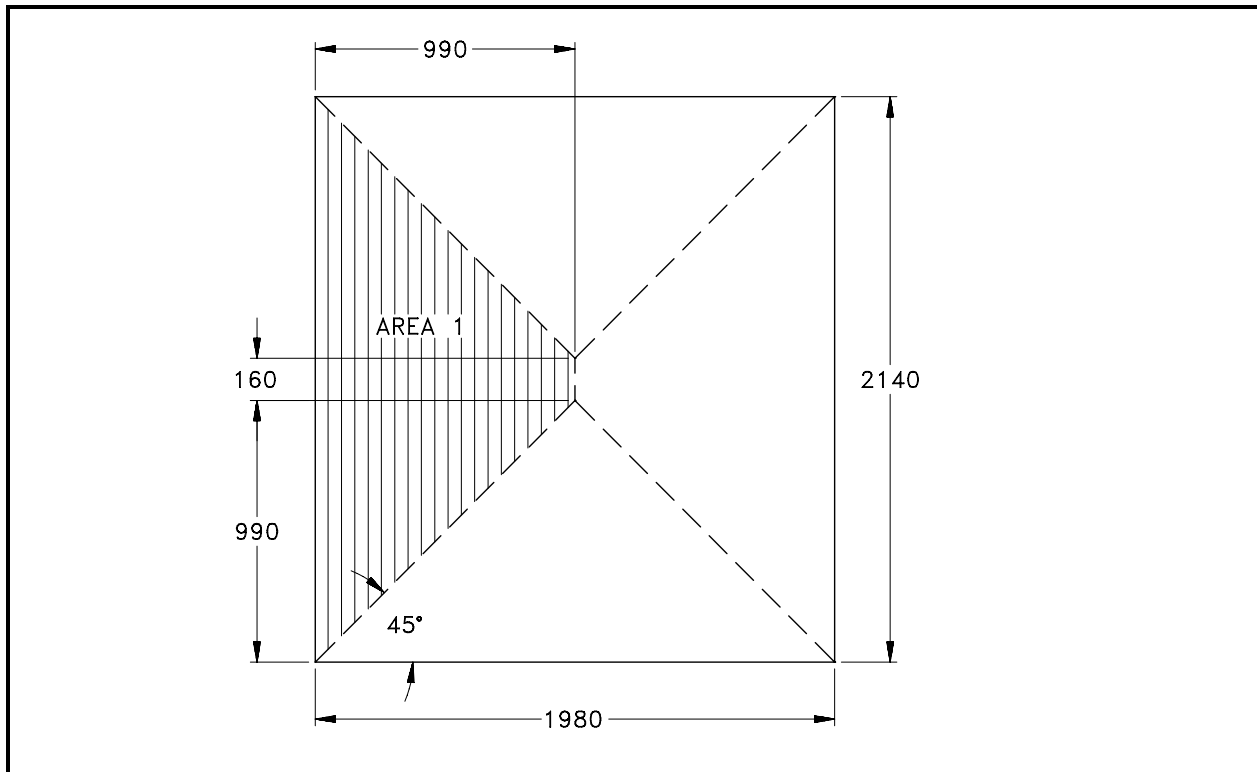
(c) – View of Area 1 on End Wall Used to Calculate End Edge Load on Side Wall
